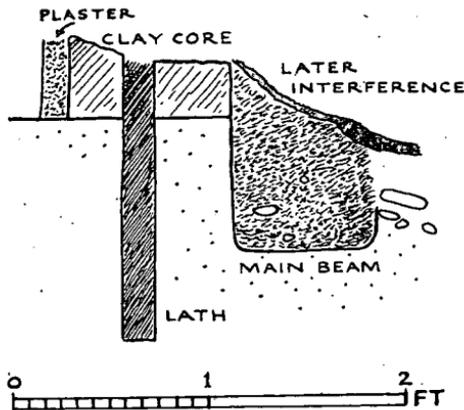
LEFT-HAND HALF OF TIMBER-FRAMED WALLING SHOWING FUNCTION OF LATHS ADJOINING MAIN FRAME, CORBRIDGE, SITE XII, 1948.
